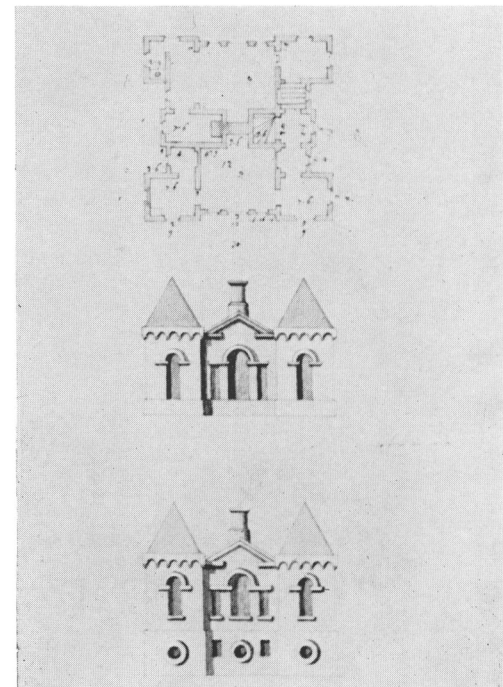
Plan and two elevations of a small house on rising ground* [92]
